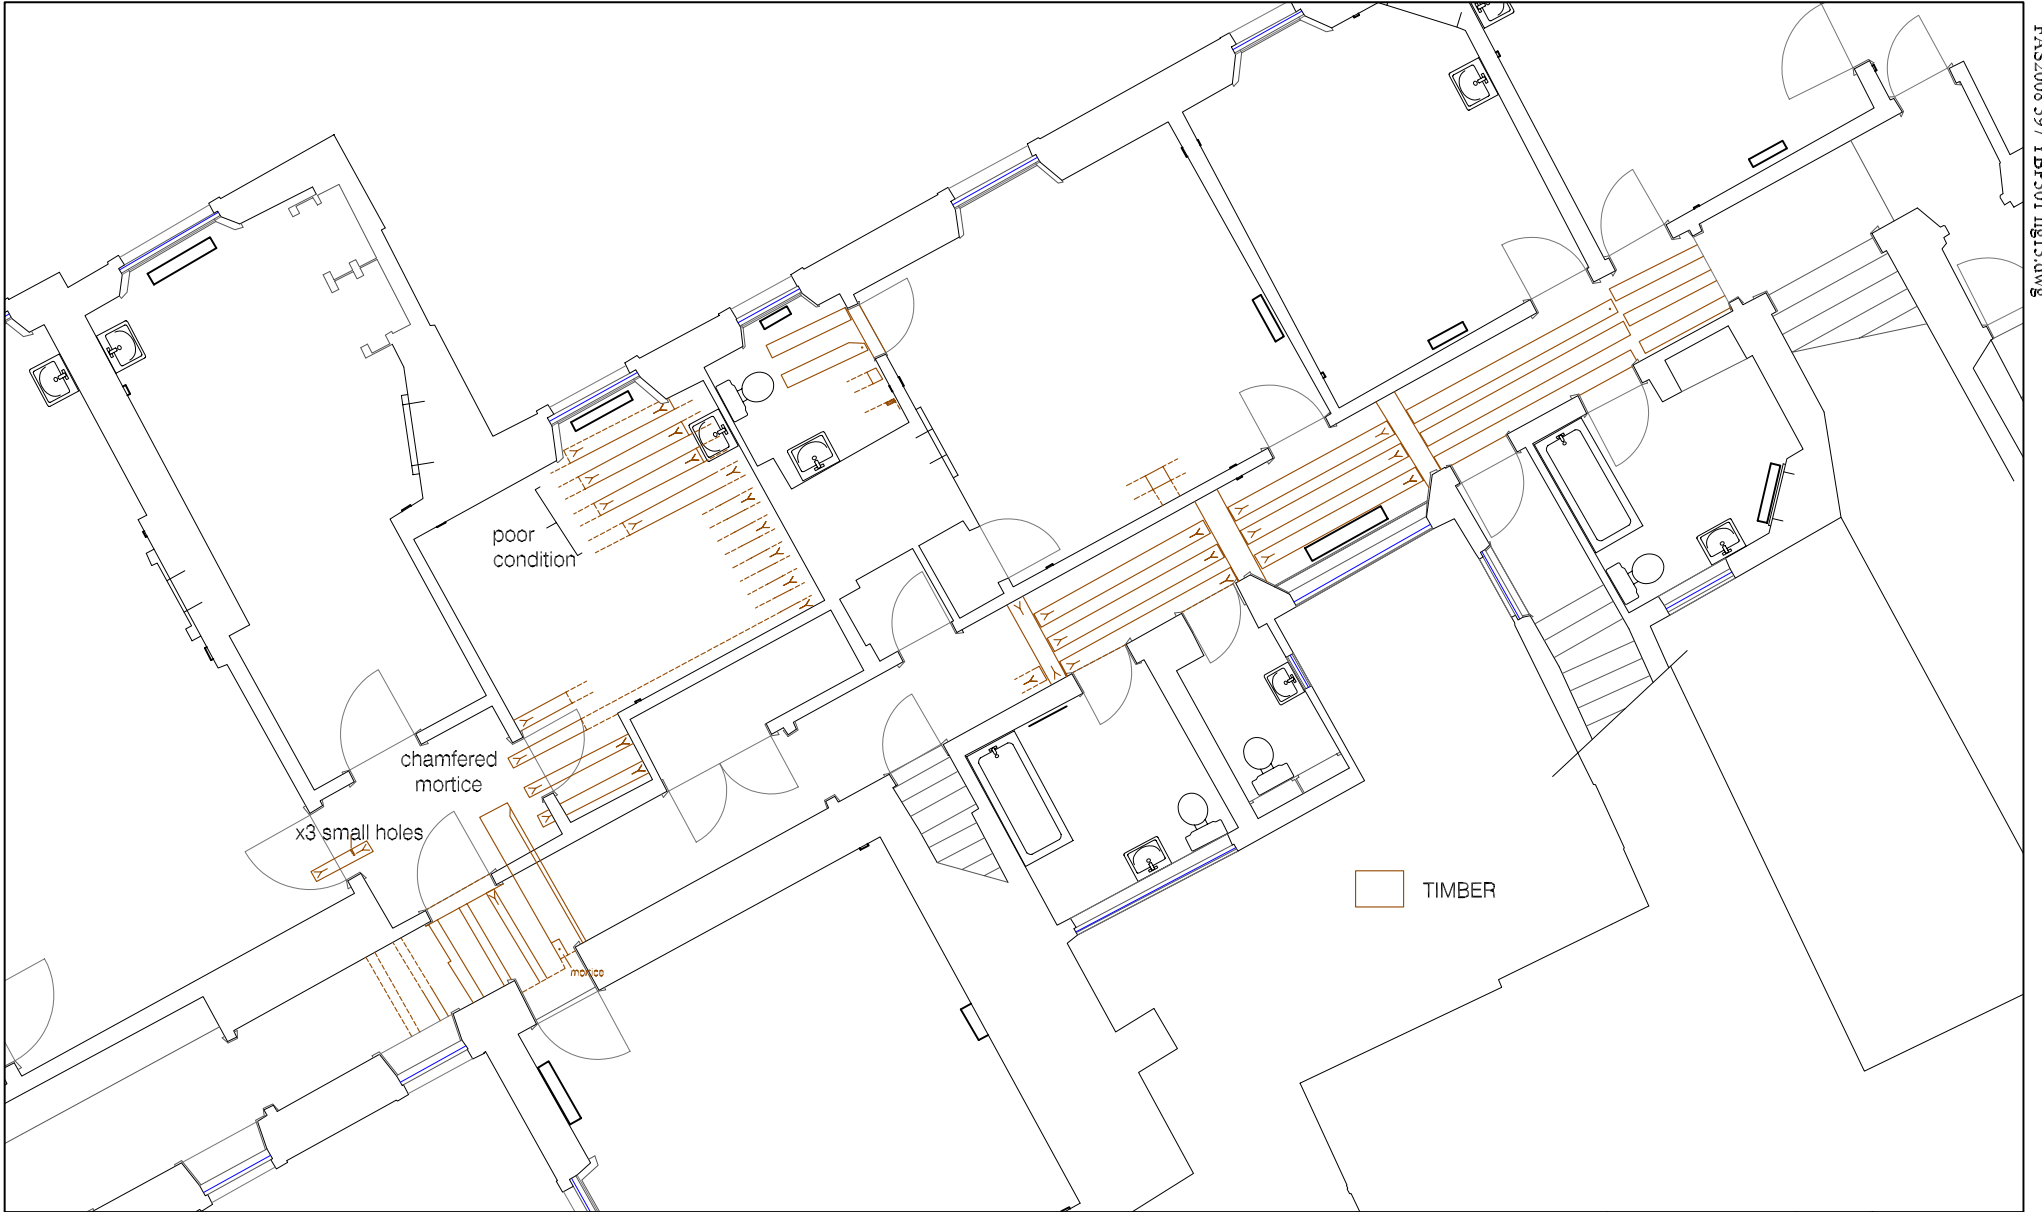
Intervention 5 - bridging beam and joists exposed at first floor level
